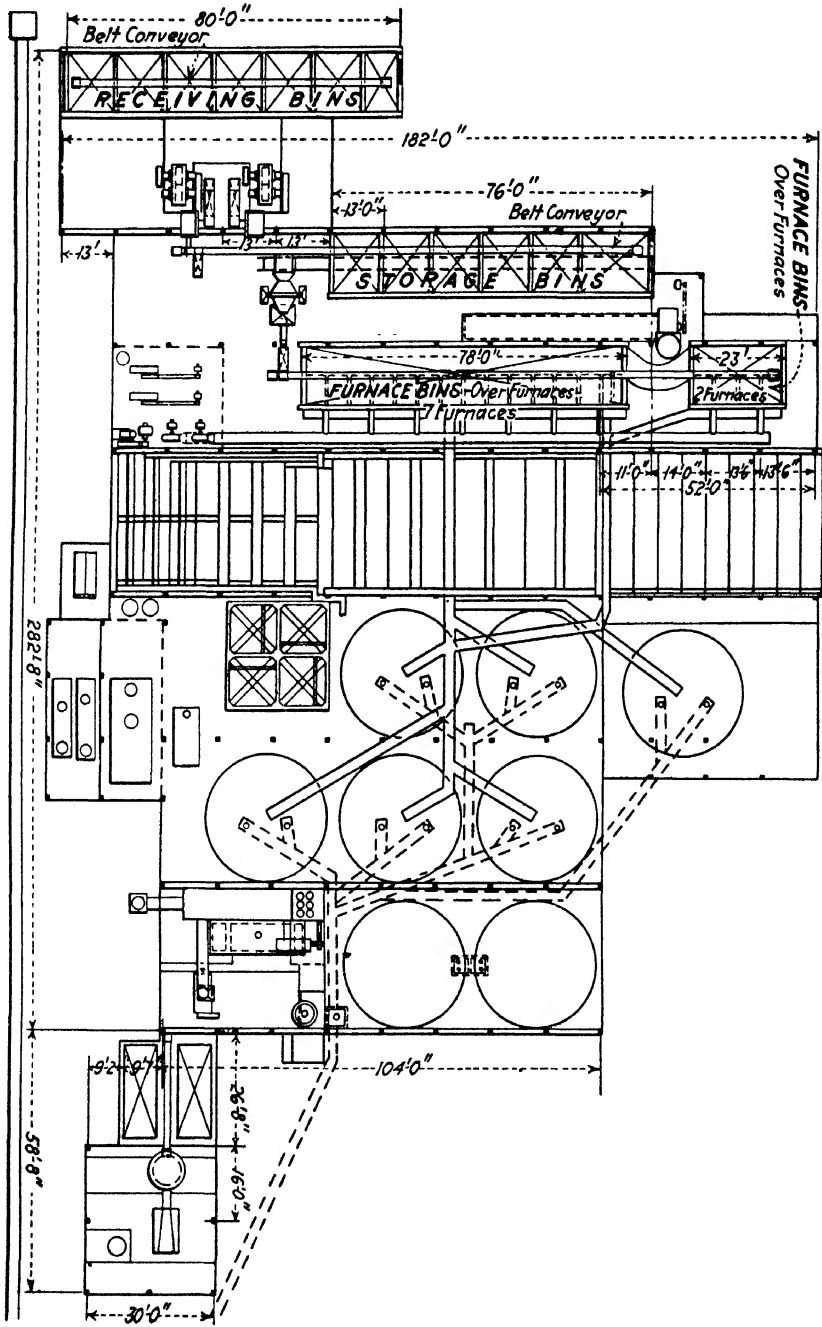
GENERAL PLAN OF MILLING PLANT.
